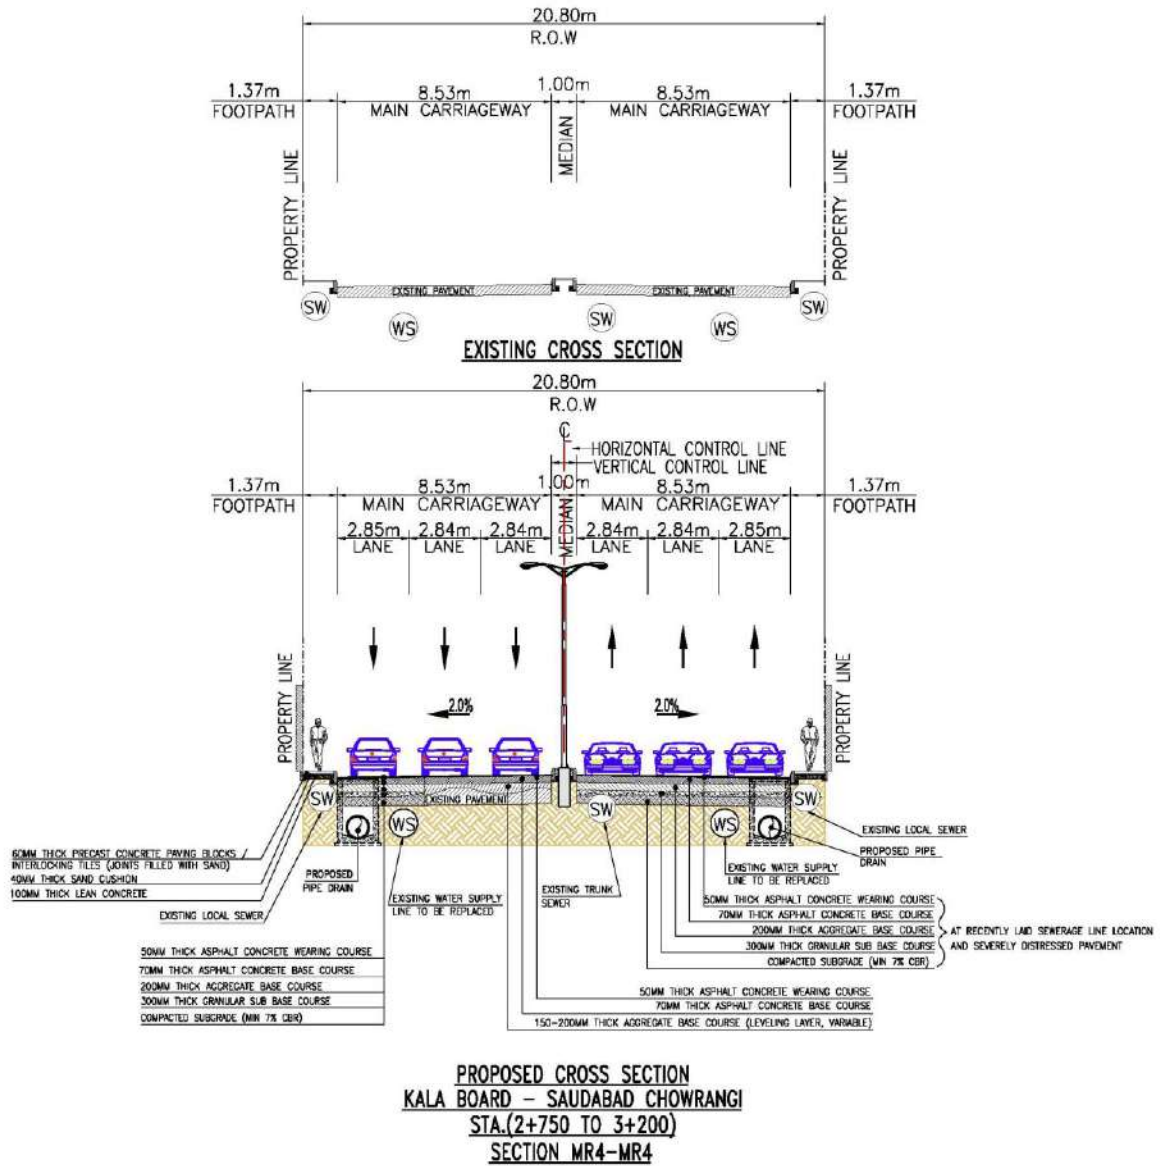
Existing and Proposed Cross Section of Kala Board to Saudabad Chowrangi (2+750 to 3+200 km)
